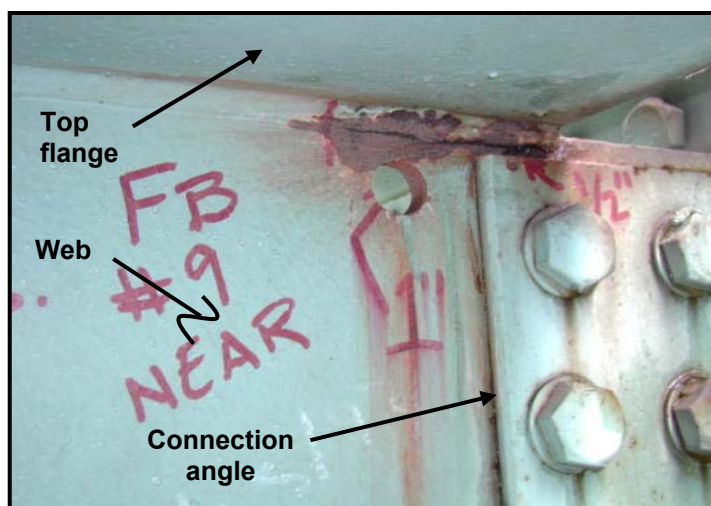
Photograph of typical crack in floorbeam at connection to tie girder.
